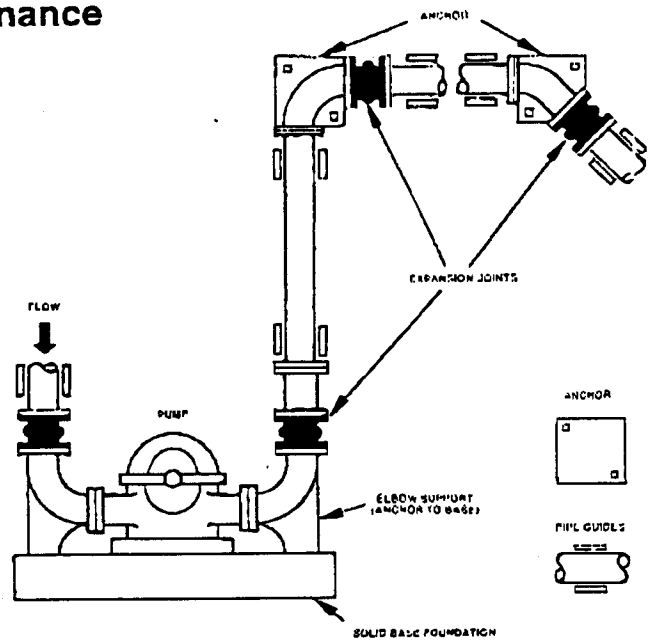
A: Typical Piping Layout Utilizing Expansion Joints When Equipment And Piping Are Properly Anchored
